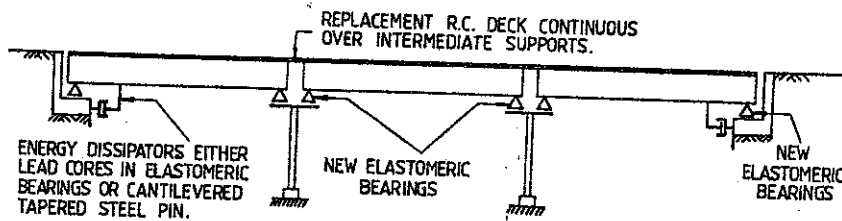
TYPICAL STRUCTURAL ARRANGEMENT OF RETROFITTED BRIDGES
